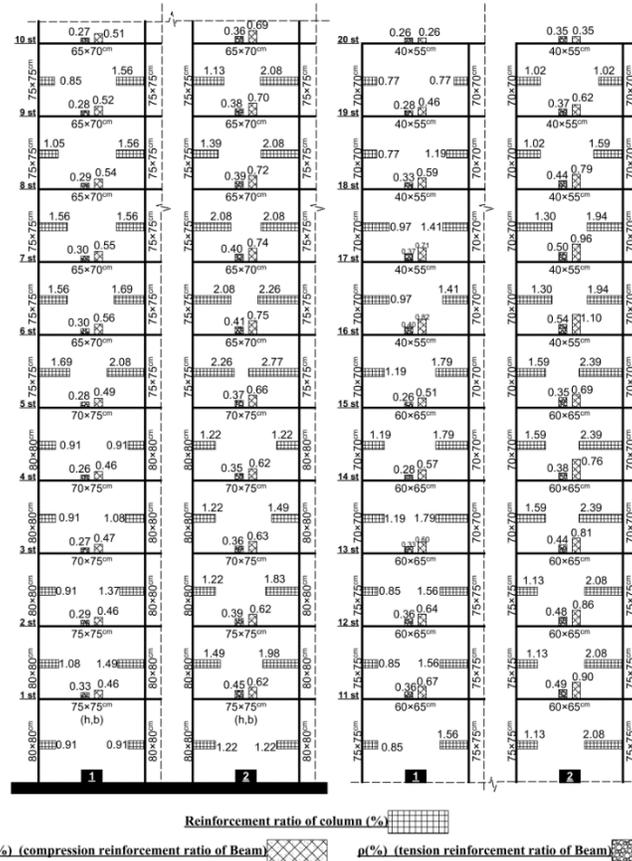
Detail of design twenty-story space frame in: 1) MPBPD method, 2) PBPB method
